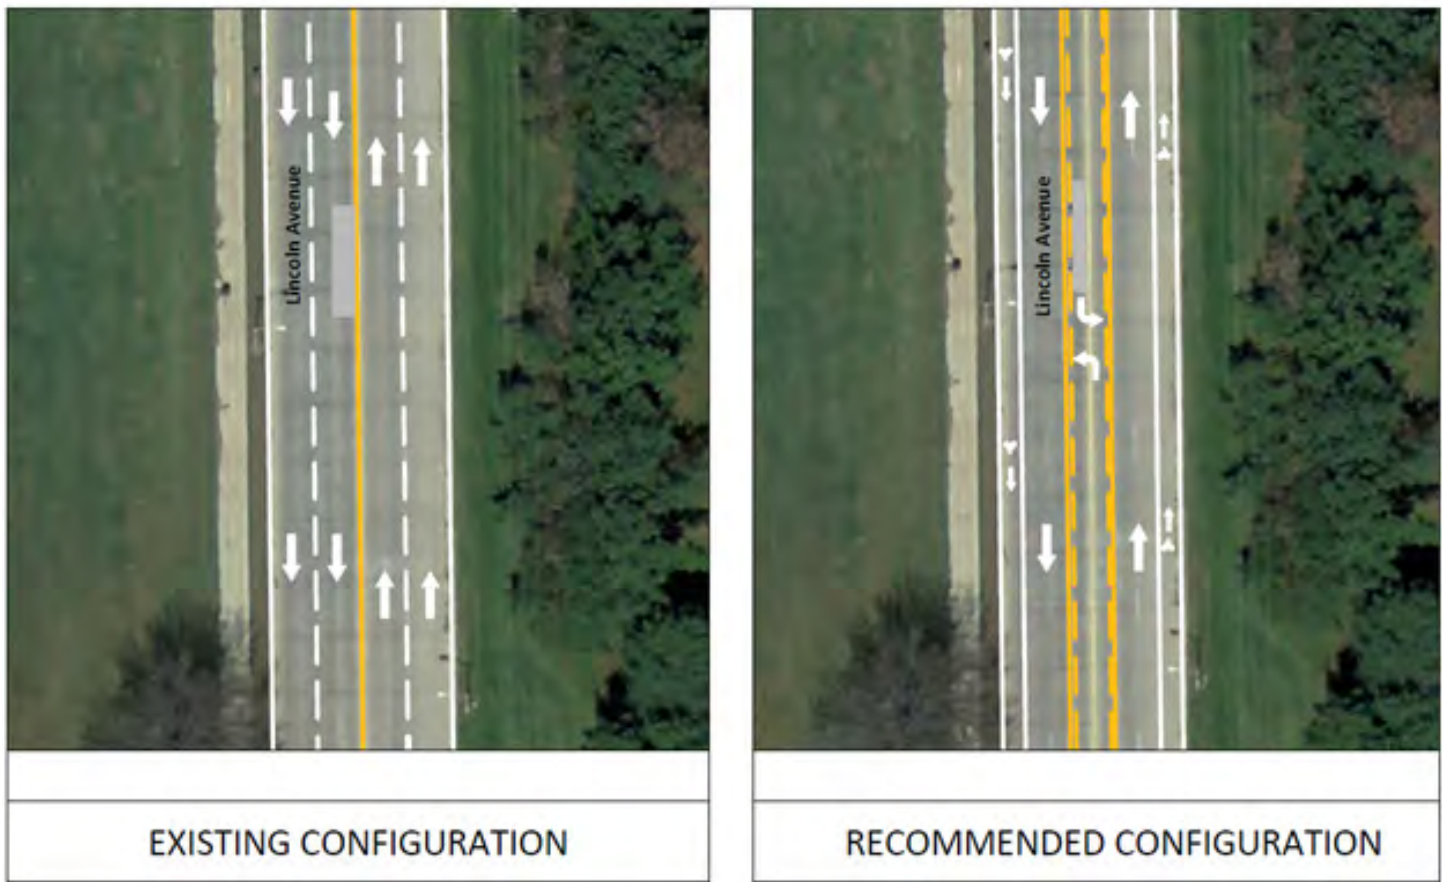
Existing and Proposed Lane Layout for Lincoln Avenue (St. Mary's Rd to Windsor Rd)
